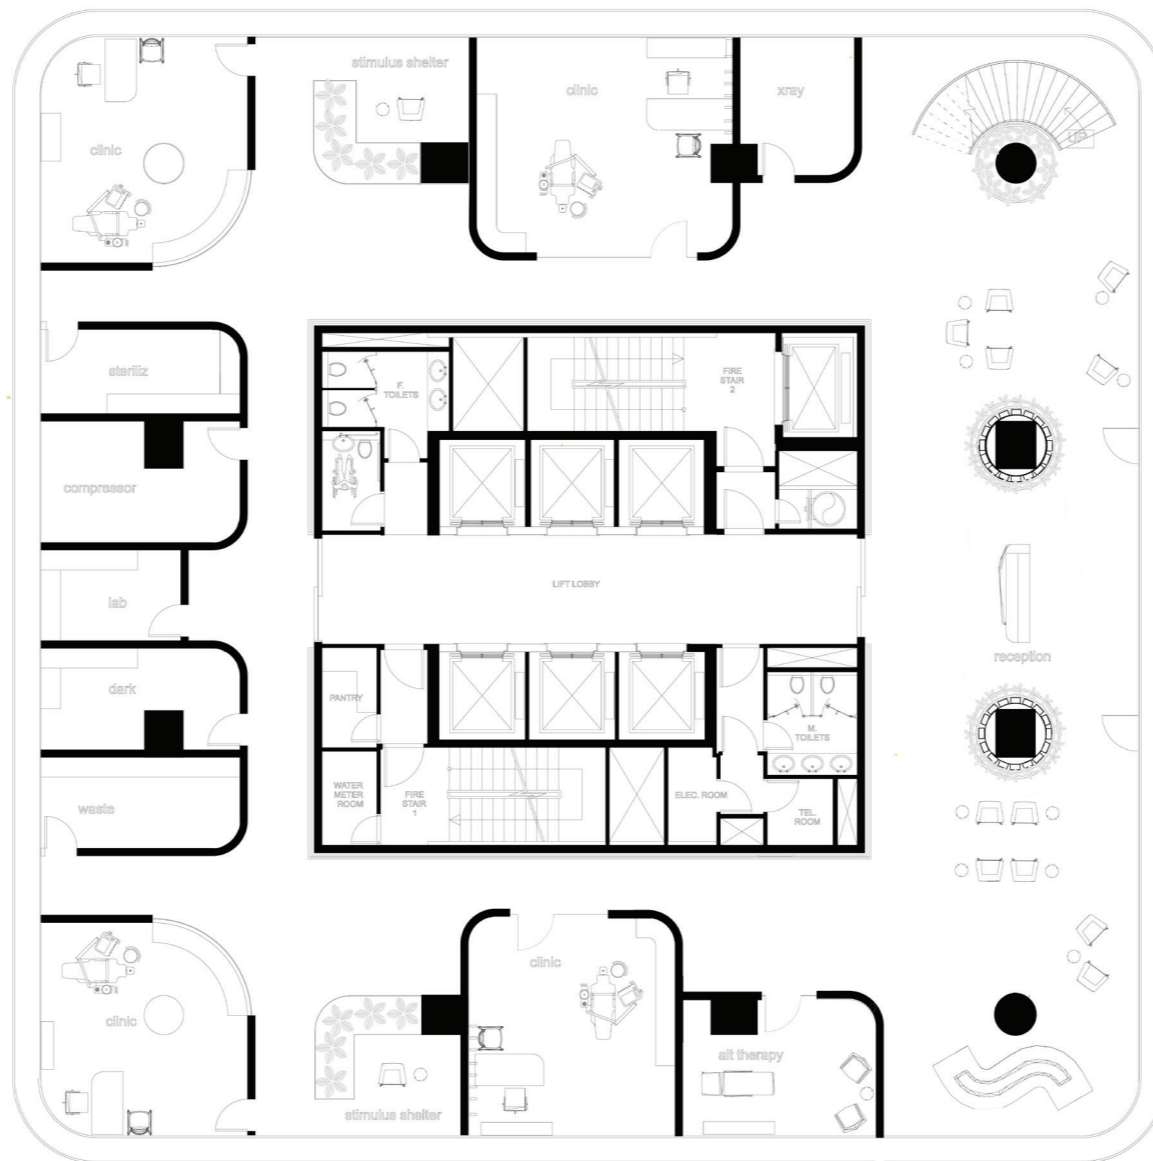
Image showing the use of potted plants in the waiting area of the ground floor
